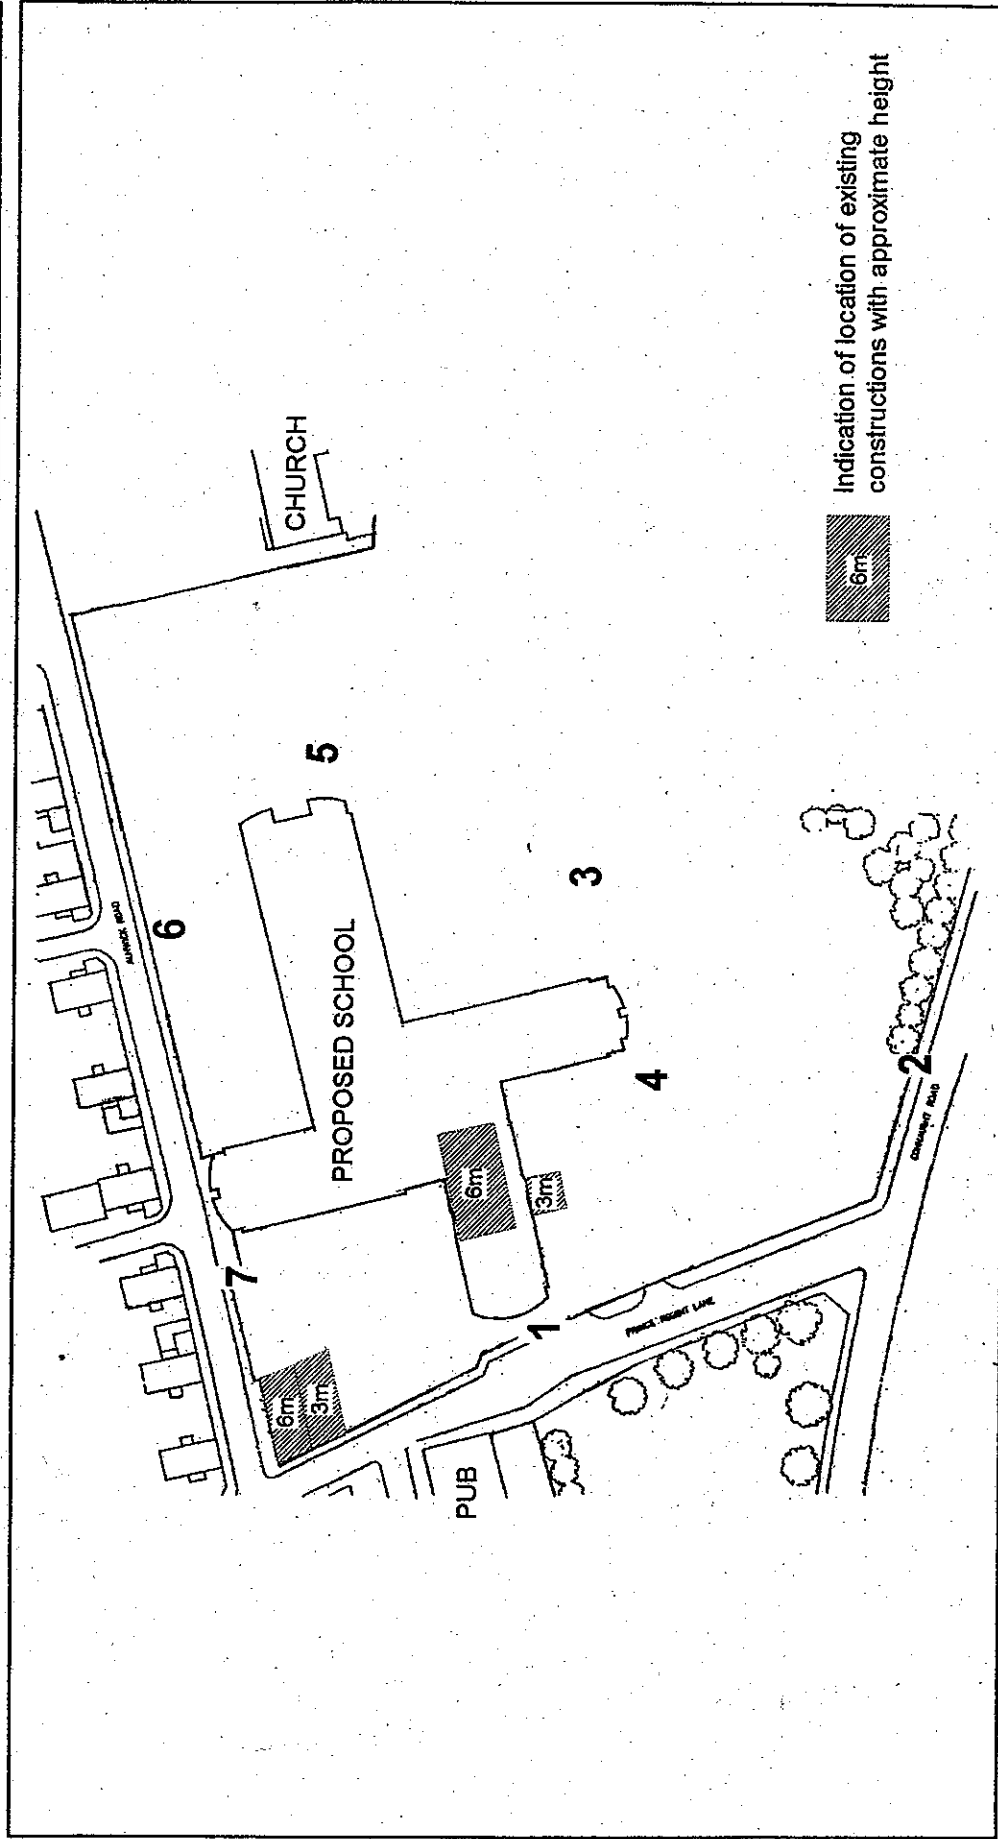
Site Plan Showing Measurement Locations, 1 to 7
